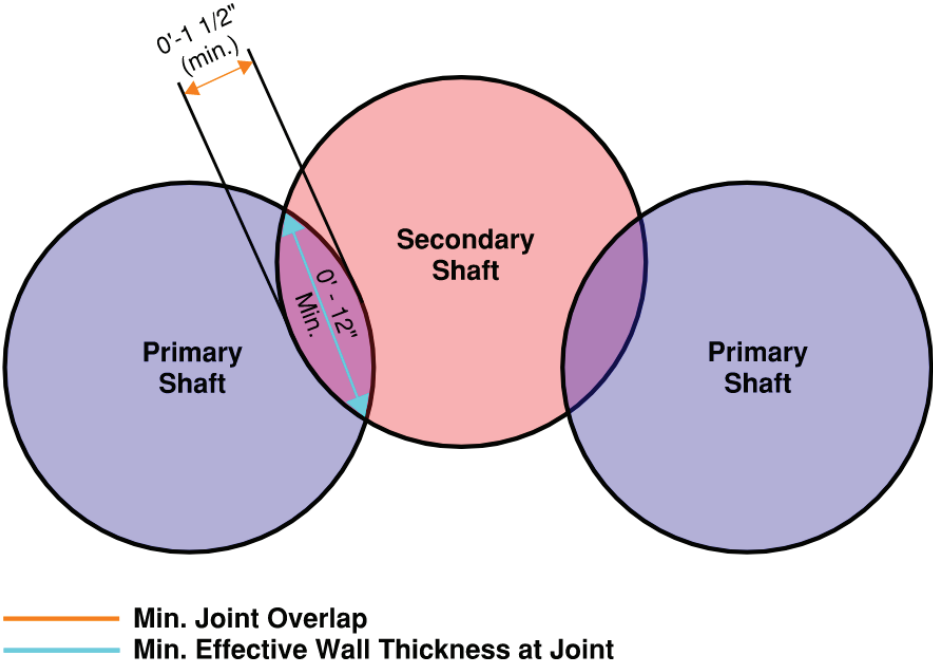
Figure A: Minimum Joint Overlap and Effective Wall Thickness for Out-of-Plumb Shafts
